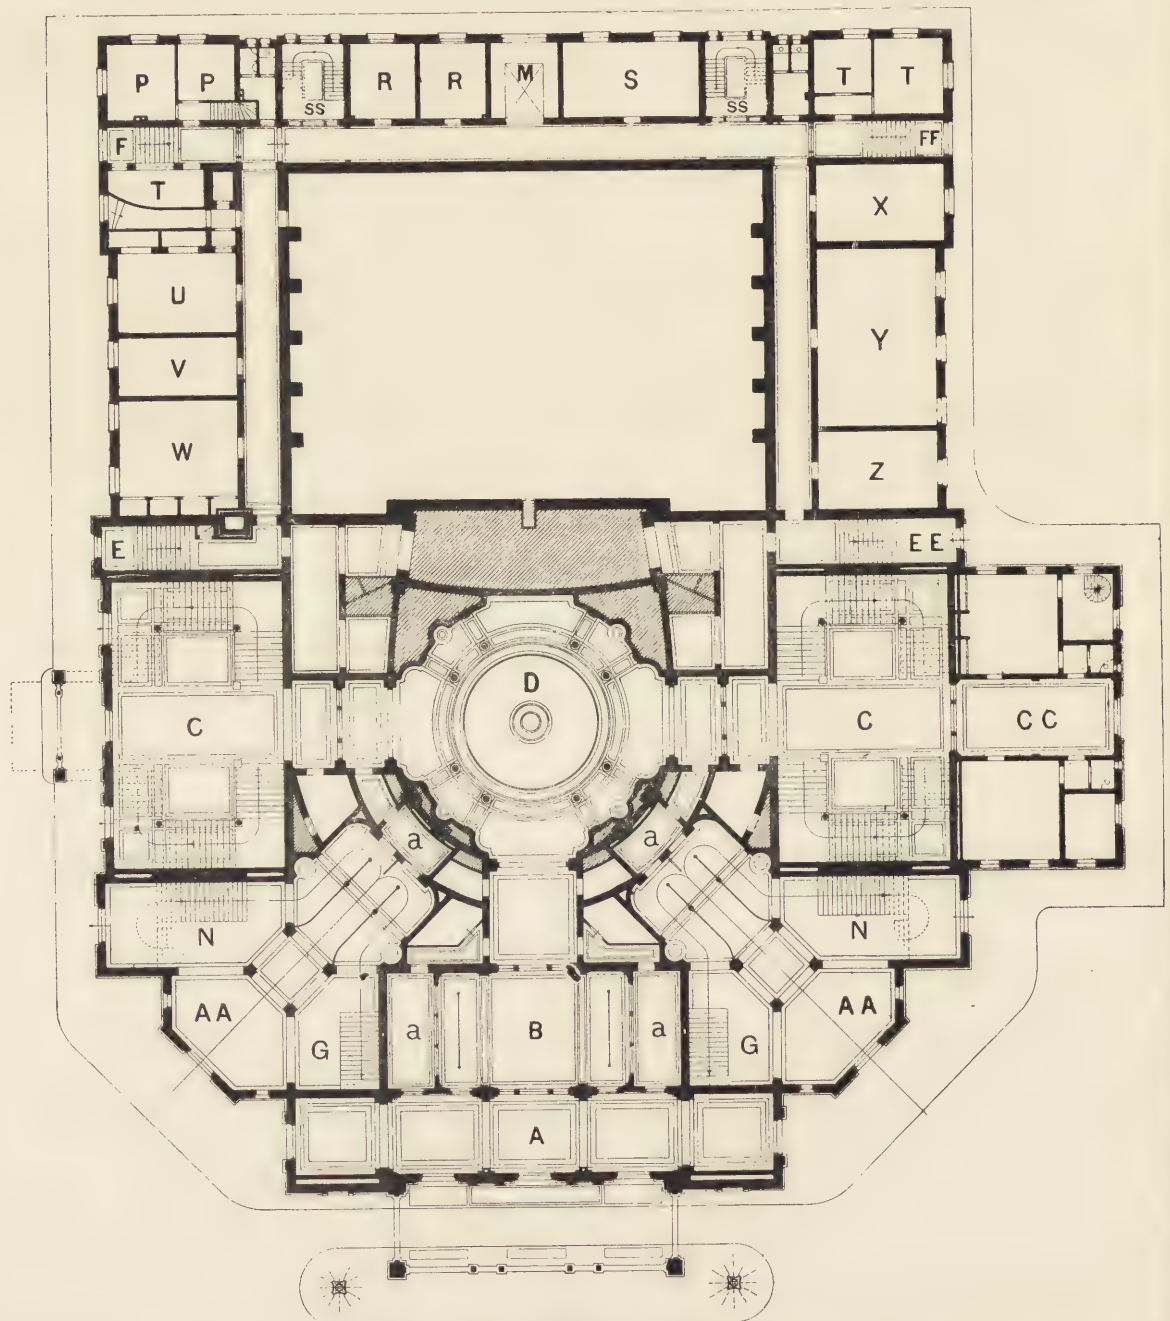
PLAN OF GROUND OR ENTRANCE FLOOR.
